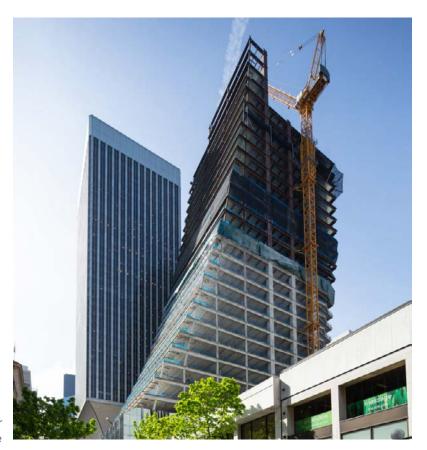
Rainier Square, Seattle The 58 storey Rainier Square building, shown in Figure 2.1, was topped out in 10 months with a SC core, compared to the 18 month period anticipated for a traditional concrete core^[4]. The choice of a SC core is reported to have saved 2% in cost^[5]. Reports also note the advantage of compatible tolerances with the floor steelwork.
